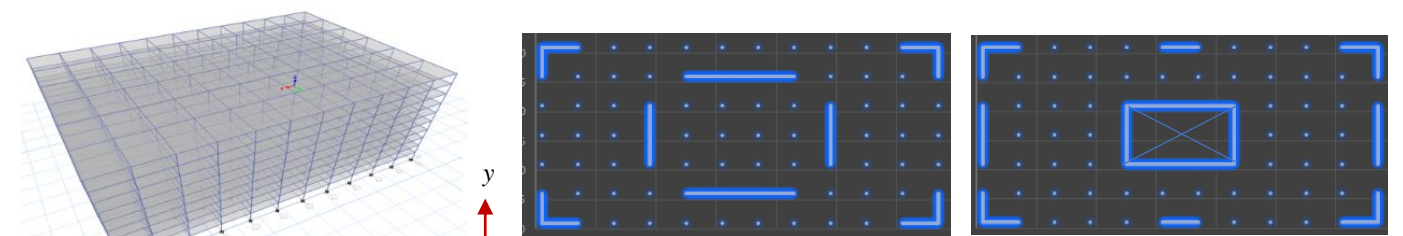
(Left) the base model; Plan views of (center) Model1; (right) Model2
